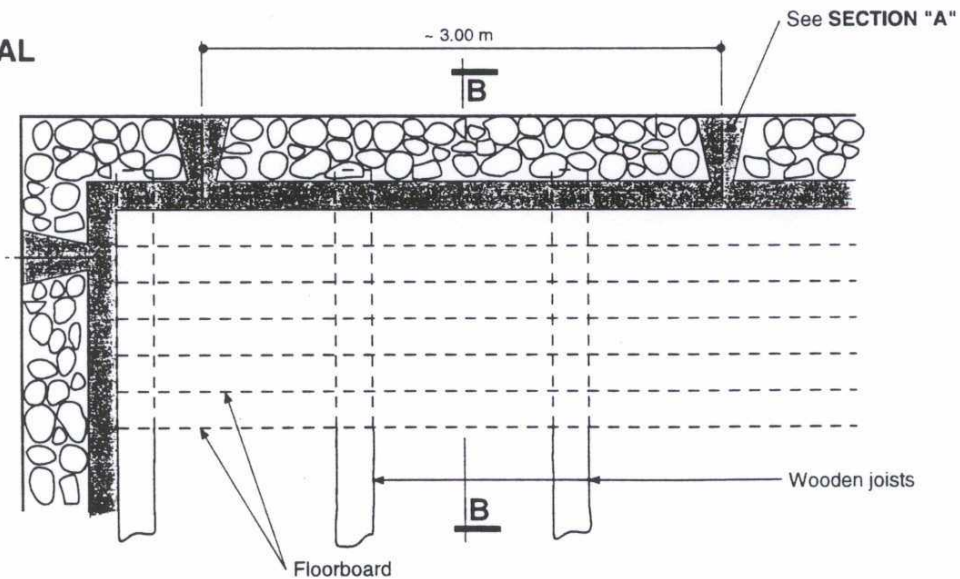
F: Seismic Strengthening - Installation of New RC Ring Beam
